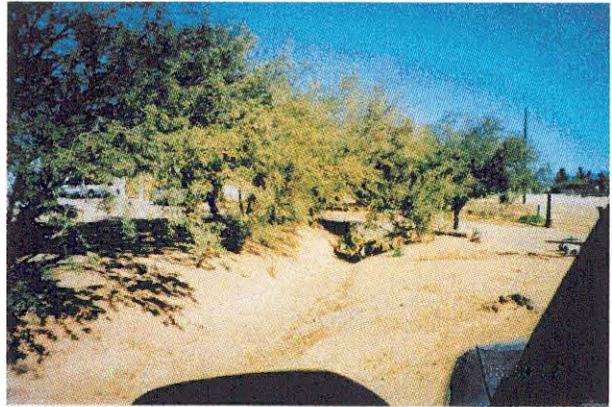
Driveway culvert limits stream capacity on Desert Lake Wash East Fork. Drainage plans must accommodate resident access.
